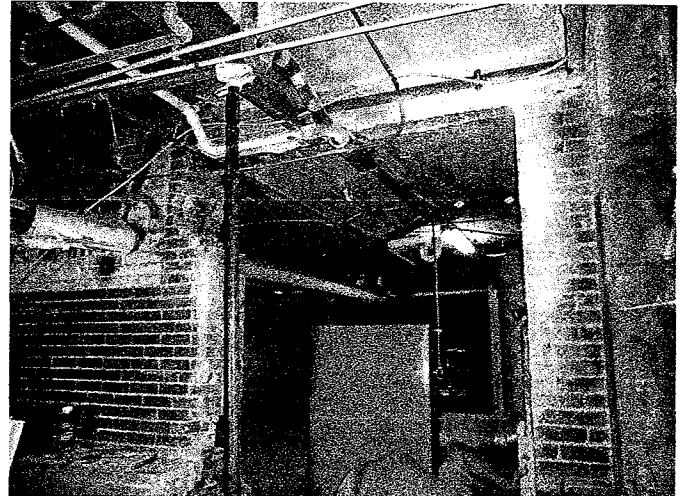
No shoring @ Bsmt Brick Opening (Grid G.8/2.3)
